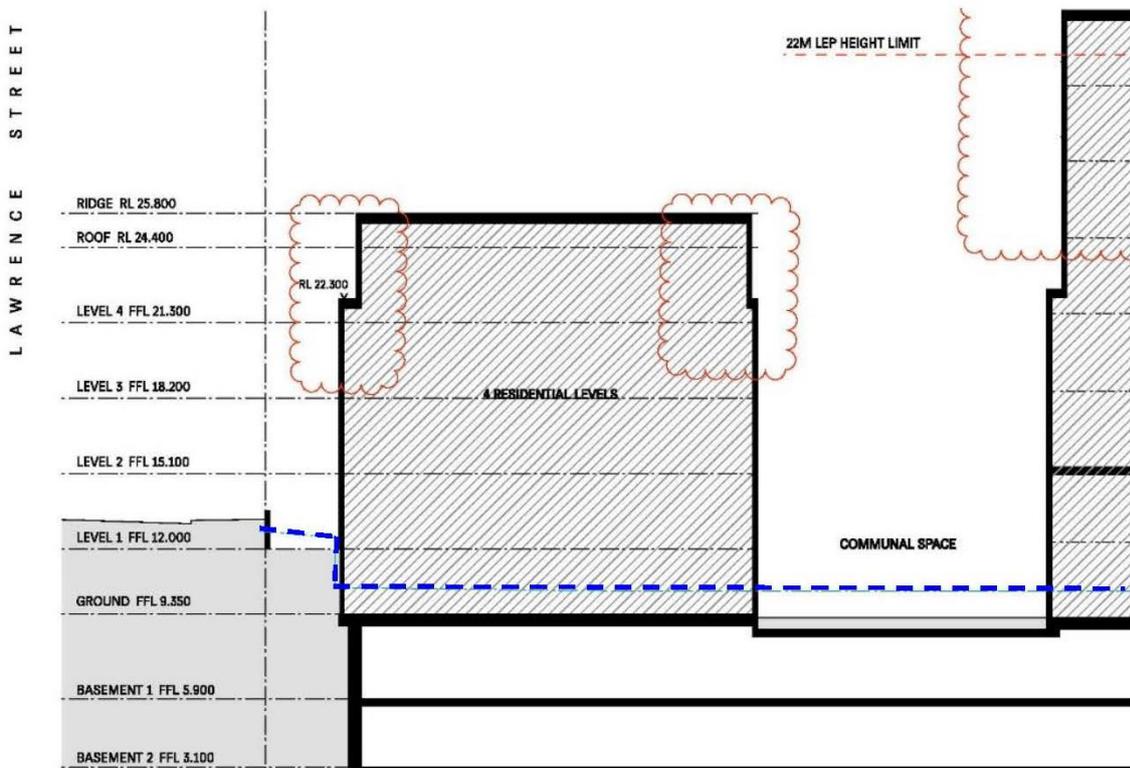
Building B: Section of amended modification (existing ground level in blue)
